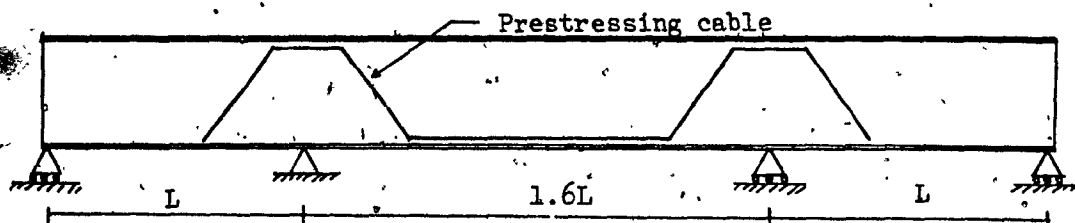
Prestressed Solution for an Unequal Three-Span Girder Bridge Using a Trapezoidal Cable Configuration.
